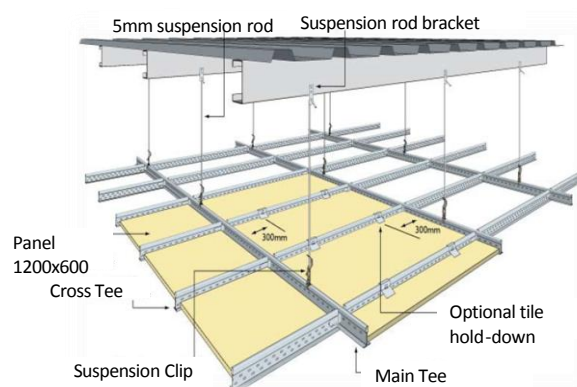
Typical ceiling configuration not showing seismic bracing (based on Rondo, 2009)
